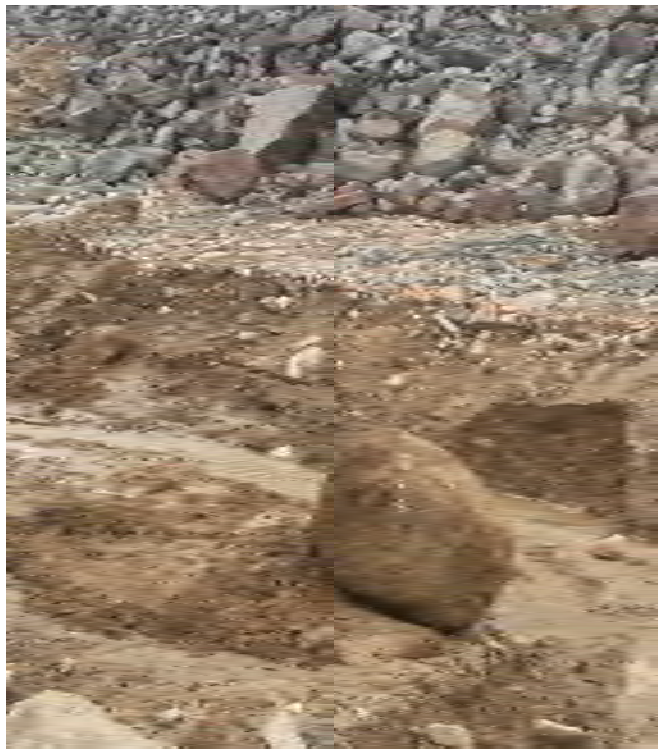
West Ditch excavation in soft soil, July 1, 2021.
